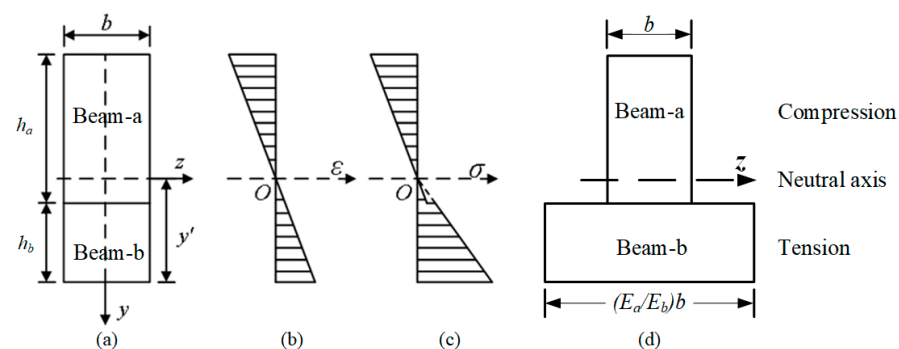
Simplified model of PE pipe–CIPP liner for stacked beams. (a) cross-sections of beams a and b; (b) bending deformation of beams a and b; (c) the neutral axis of the beams a and b; (d) combined cross section of beams a and b.
